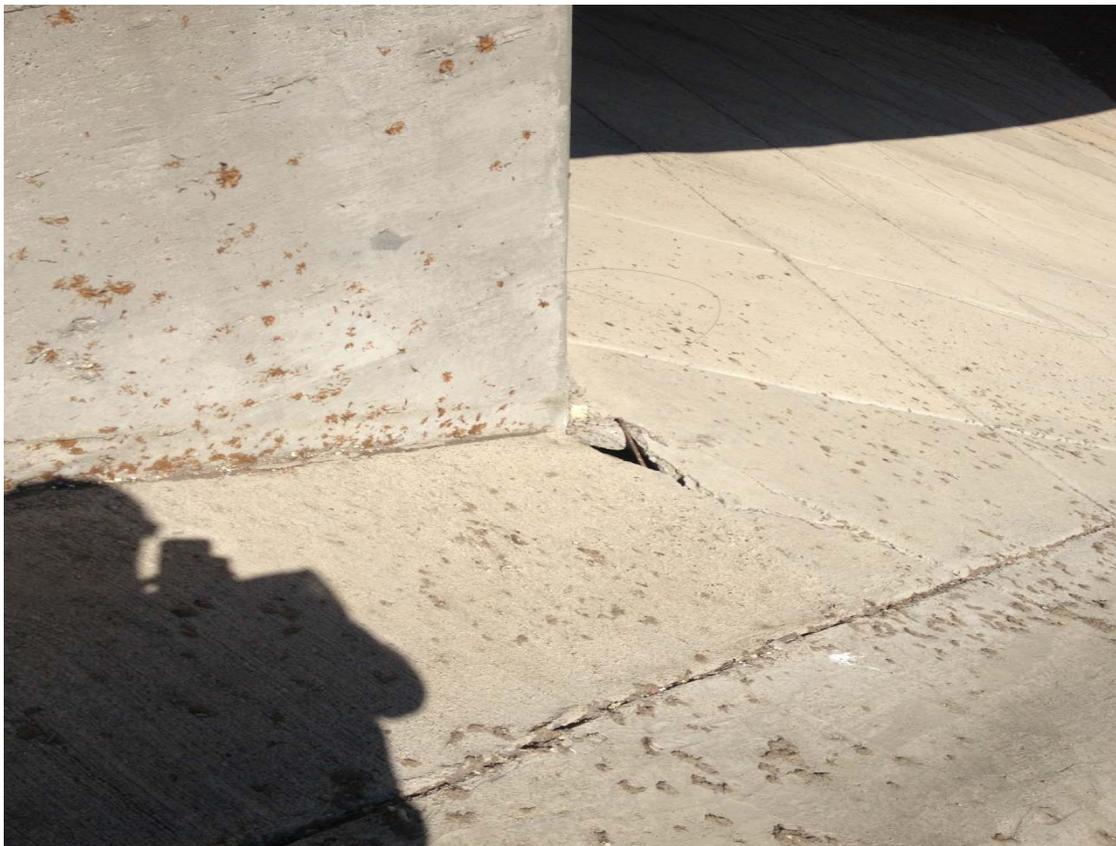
Bridge No. 55-0659G View of Left Unpaved Shoulder
